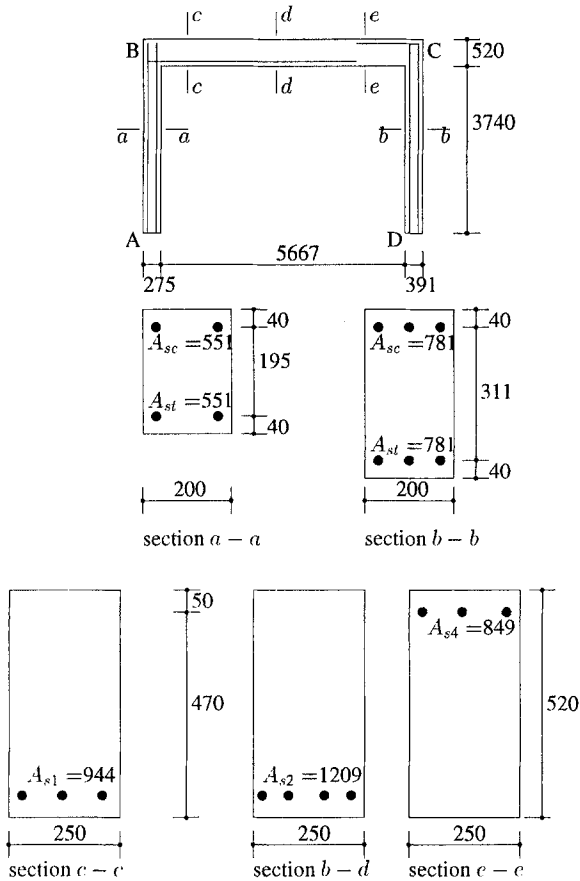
Elevation and cross-sections of minimum cost RC portal frame
